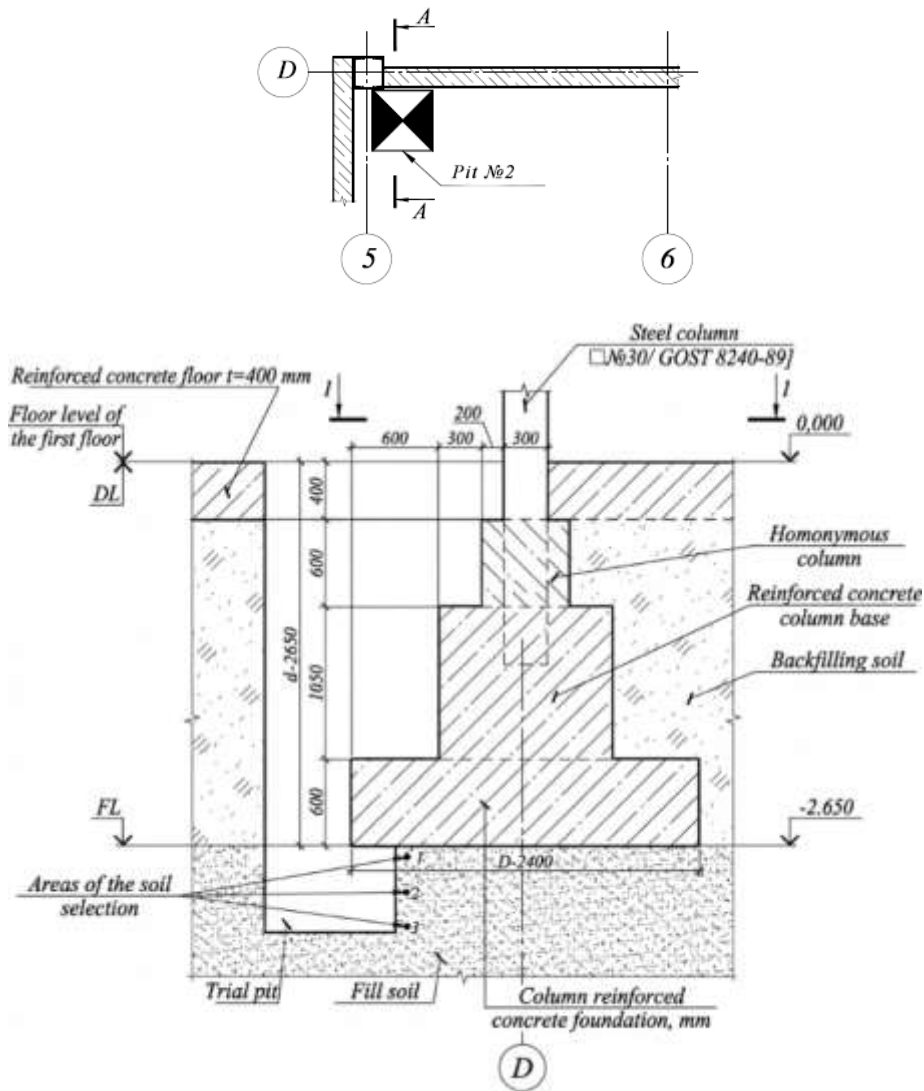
Scheme of the layout of the pit No. 2 and section A–A
